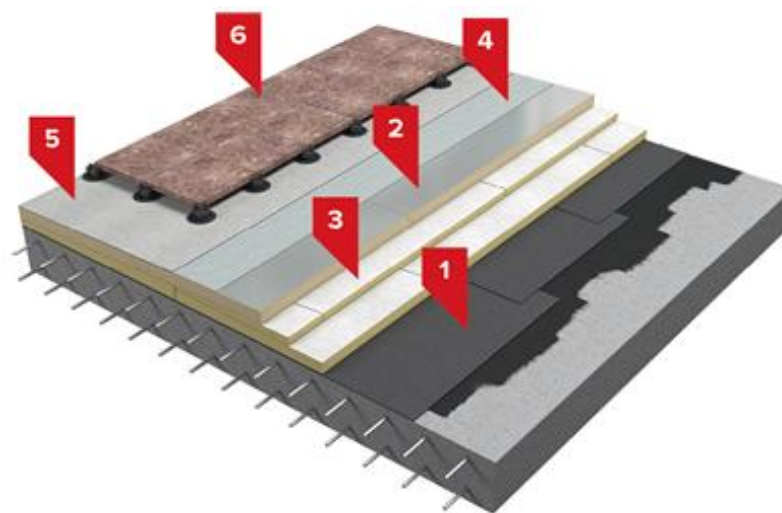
TN-Roof Terrace Pavement system from TechnoNICOL (TechnoNICOL)
